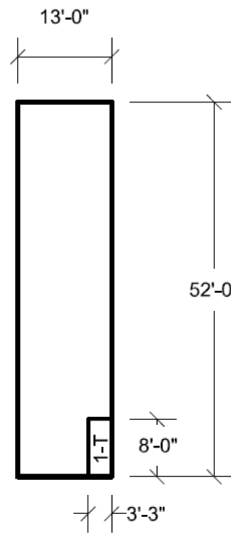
H.6-81 Pump House East Buttress Looking North & Pump House West Buttress Looking South Transverse Reinforcement Zones
